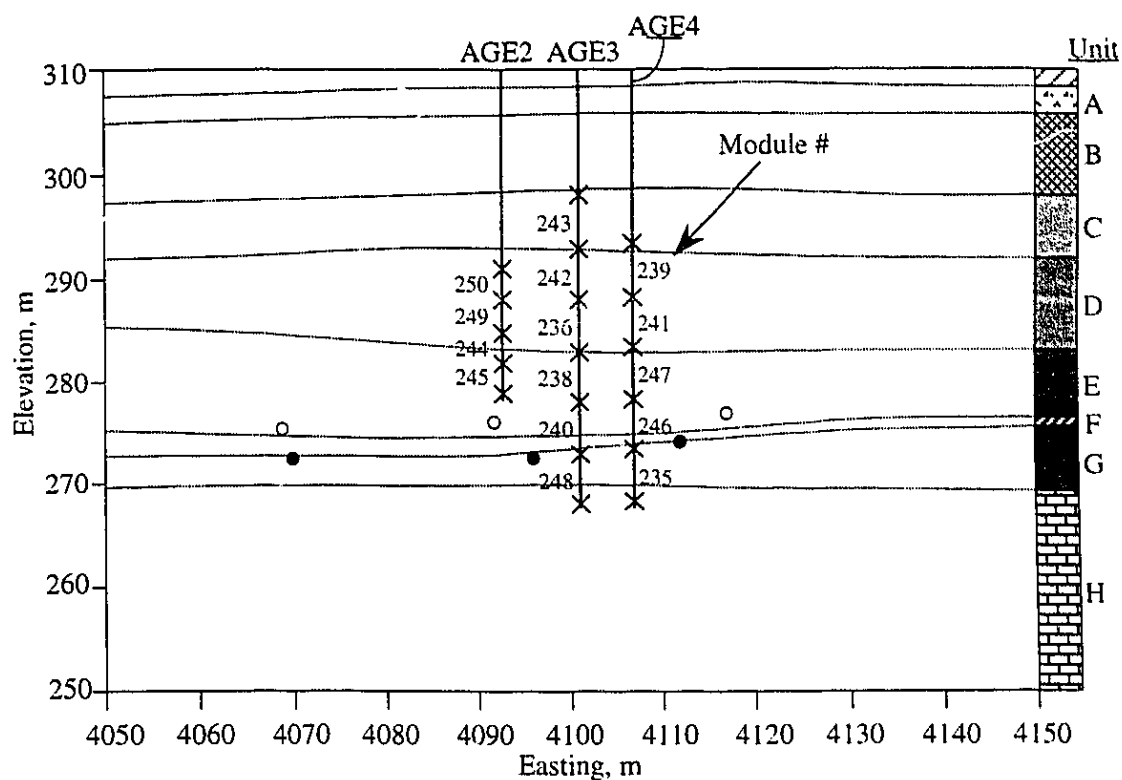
Location of Extensometer Modules within Geotechnical Cross Section
